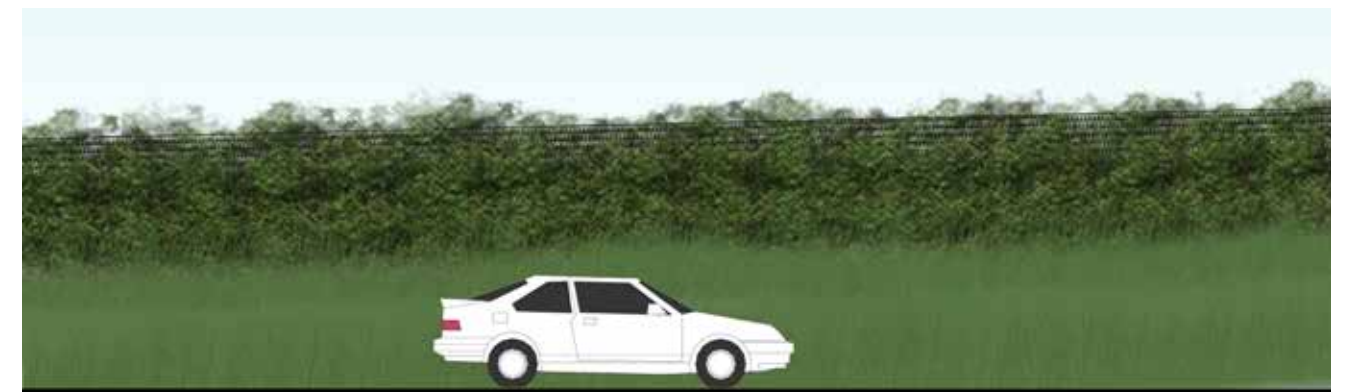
Headlight Screen HS01 - elevation from highway
